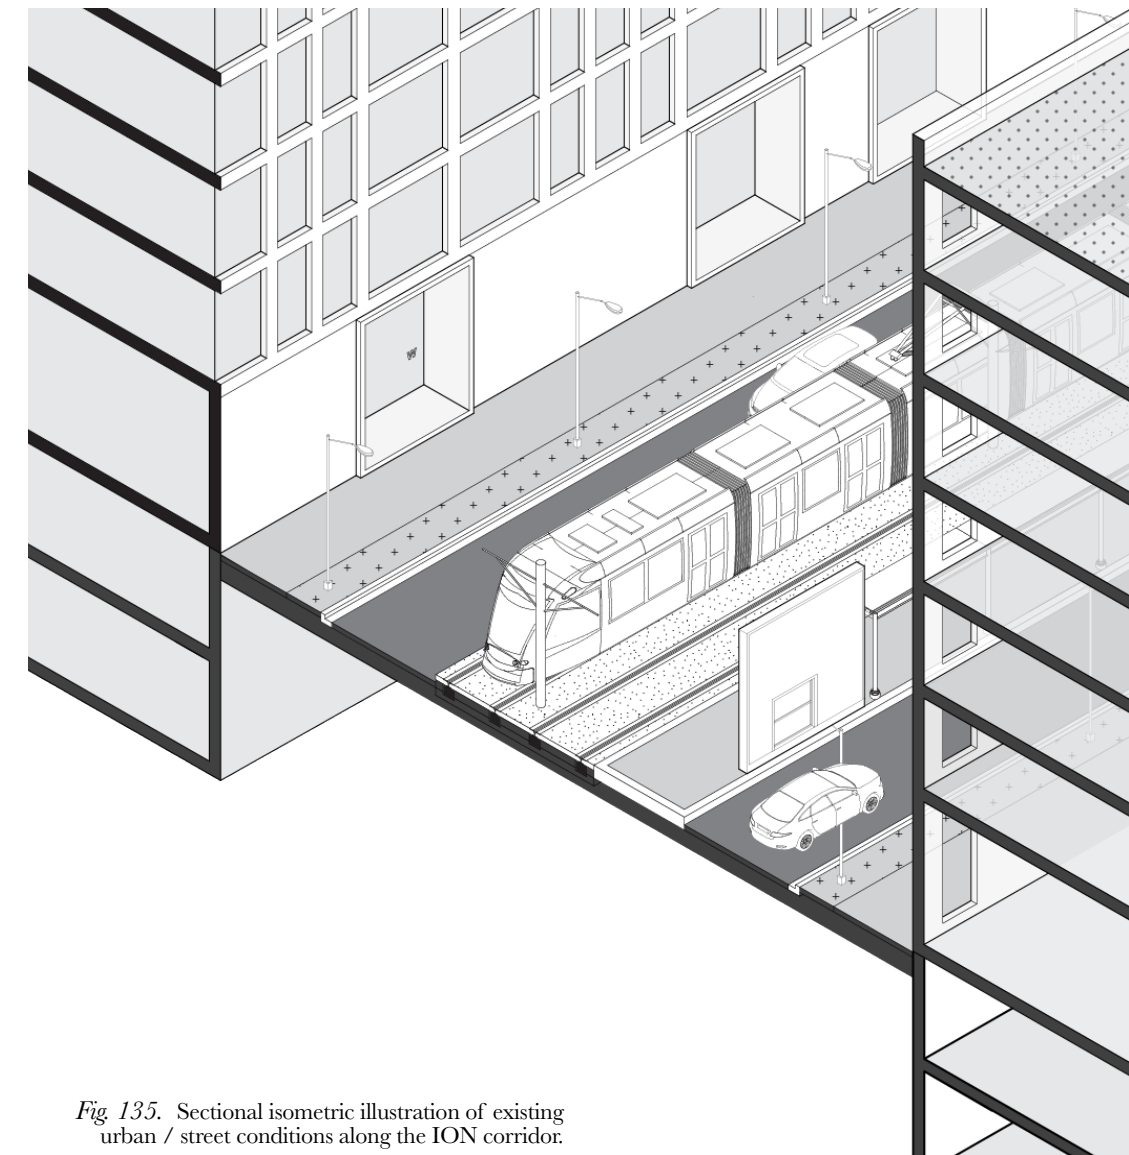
Sectional isometric illustration of existing urban / street conditions along the ION corridor.
